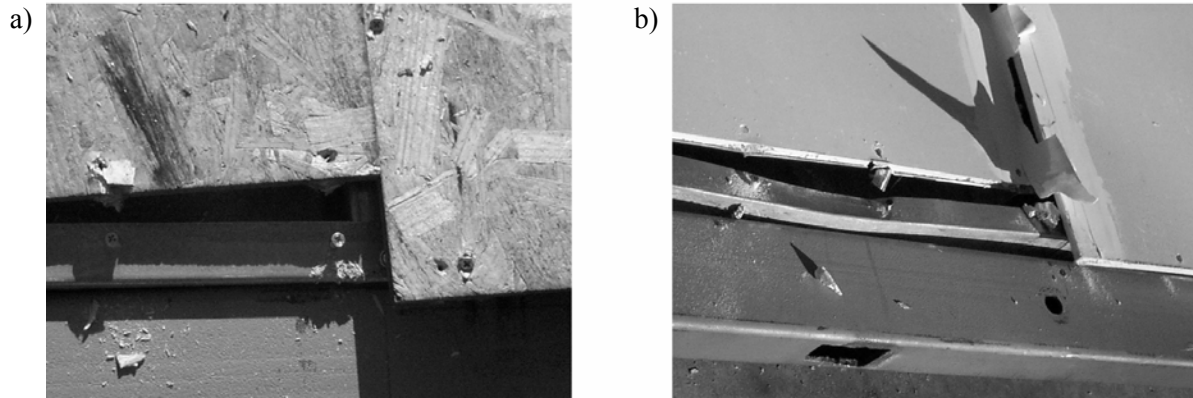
Typical failure modes of sheathing connections: a) OSB, b) gypsum wallboard.
